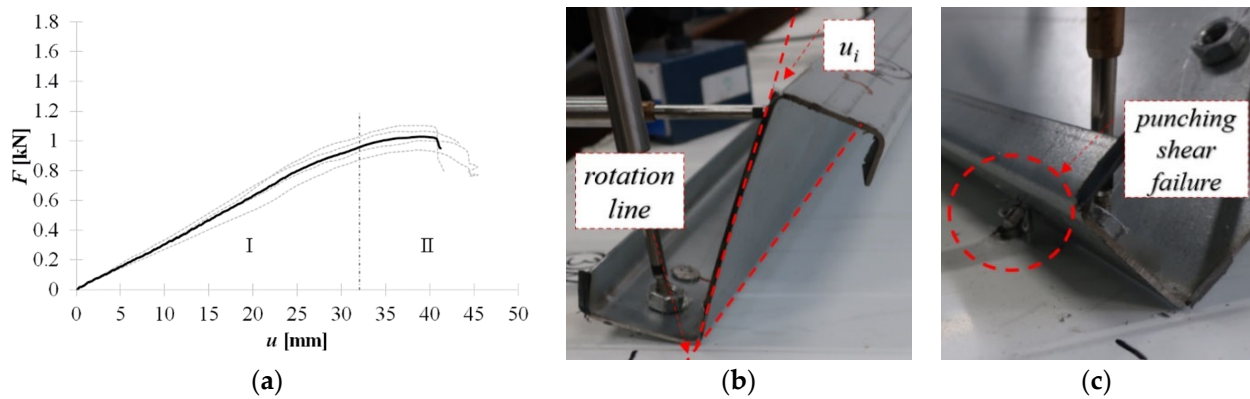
Pulled blind rivet: (a) equilibrium load-displacement paths, (b) cross-section rotation at stage I, (c) punching shear failure at stage II.
